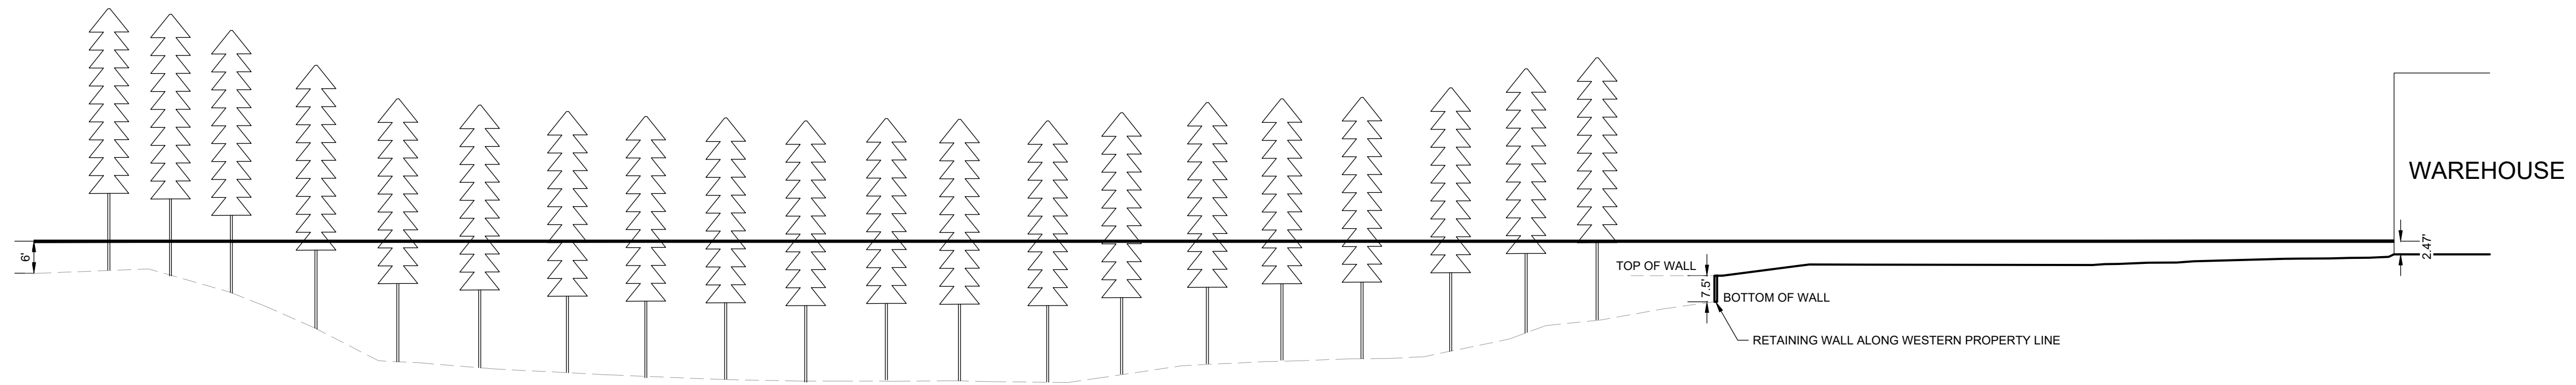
EXHIBIT B - SOUTHERN RETAINING WALL VIEWSHED SECTION
